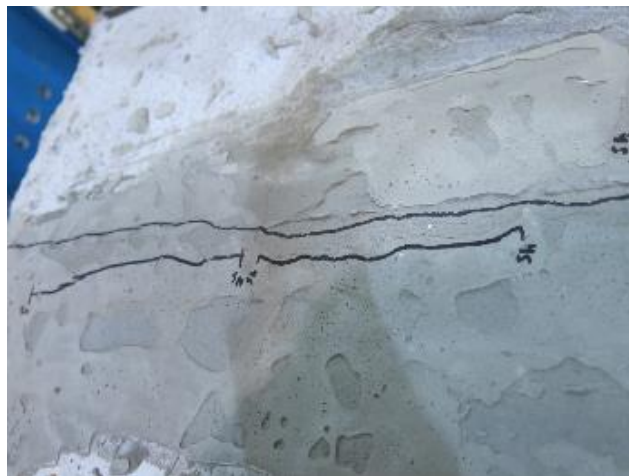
Top of shear key prior to testing showing marked shrinkage cracks
